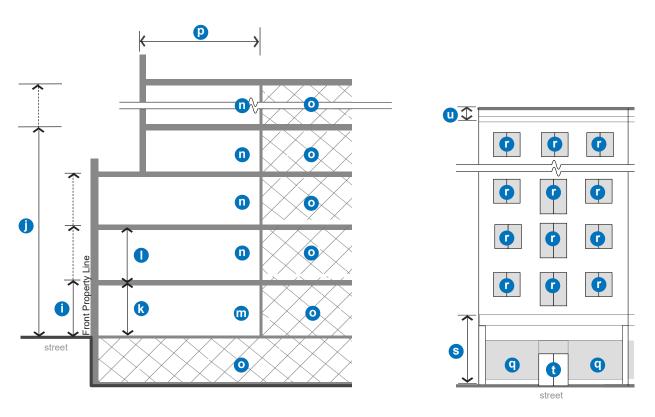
(A)(2) Storefront Building: Height and Use Requirements
